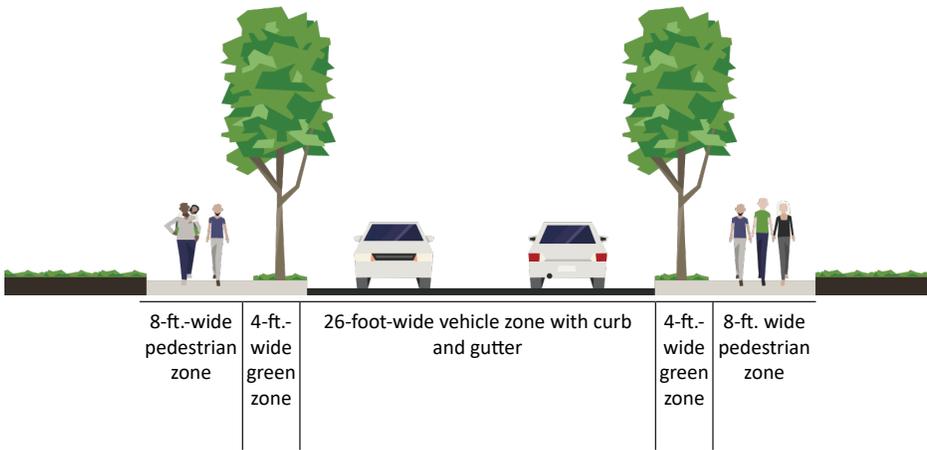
New Local Streets Cross Section (50-foot-wide right-of-way)(above).
